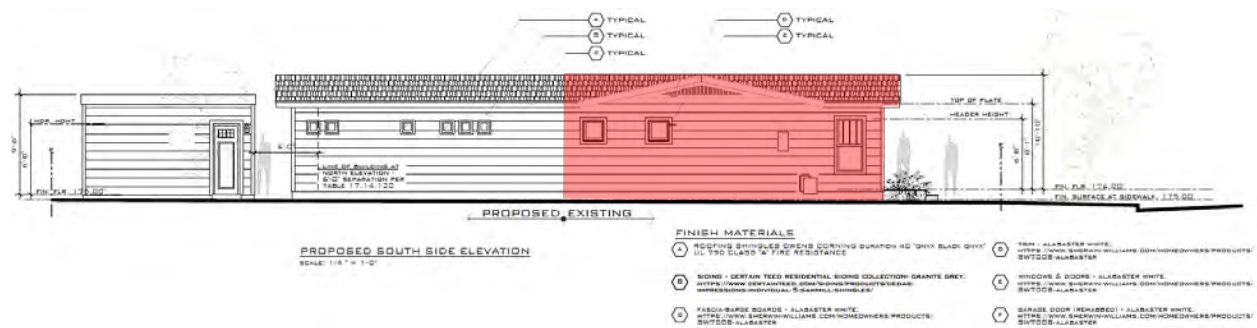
Proposed south elevation. The area of the existing residence is shaded red. Source: Architectural Design Solutions, "Regalado Remodel," Sheet A-6. November 19, 2024. Edited by Page & Turnbull.
